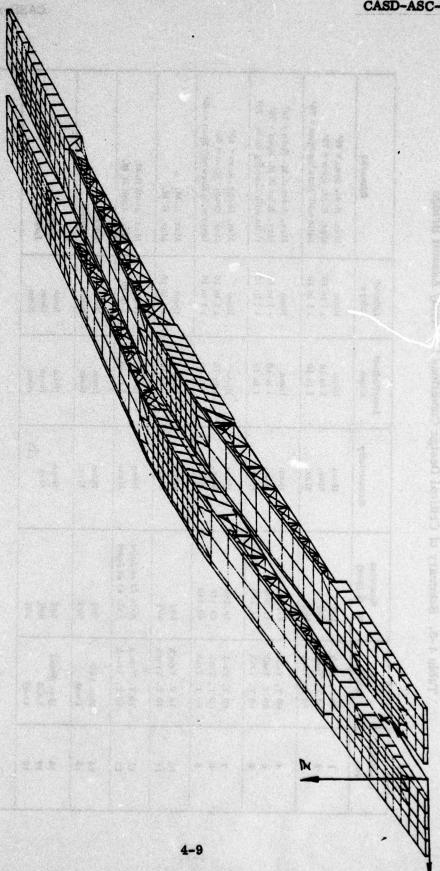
Army Assault Bridge with Composite Test Section-Finite Element Model
